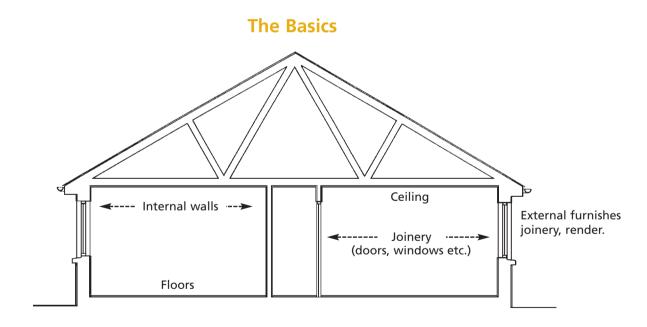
Section through typical school building, highlighting typical elements whose finishes require maintenance.
